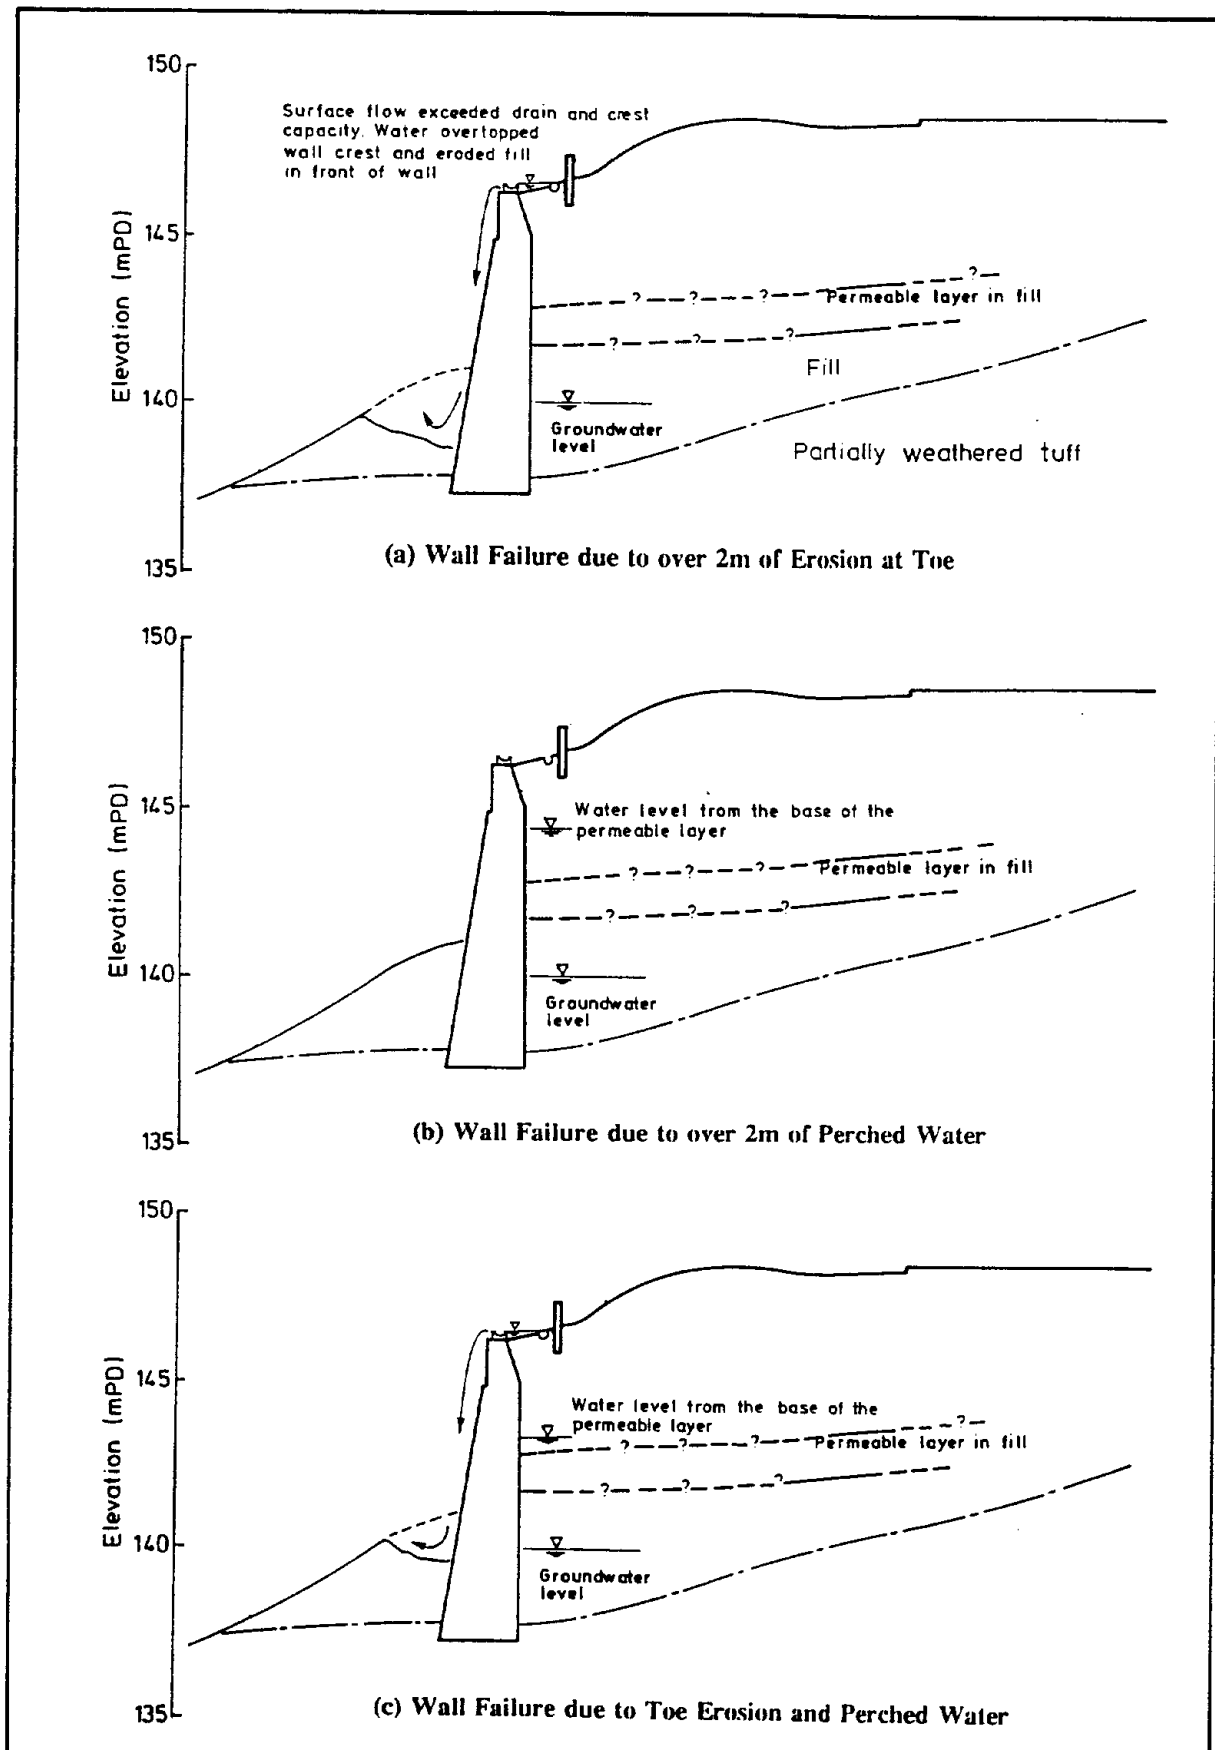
Possible Conditions for the Failure of the Masonry Retaining Wall
